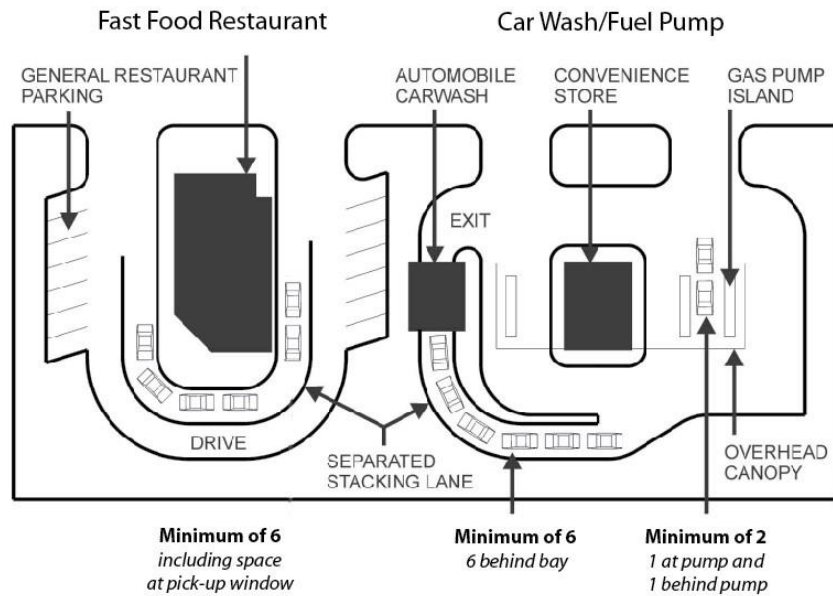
D: Location of stacking spaces and lanes. Note that the stacking lanes are oriented toward the side and rear yards rather than the front yard.
